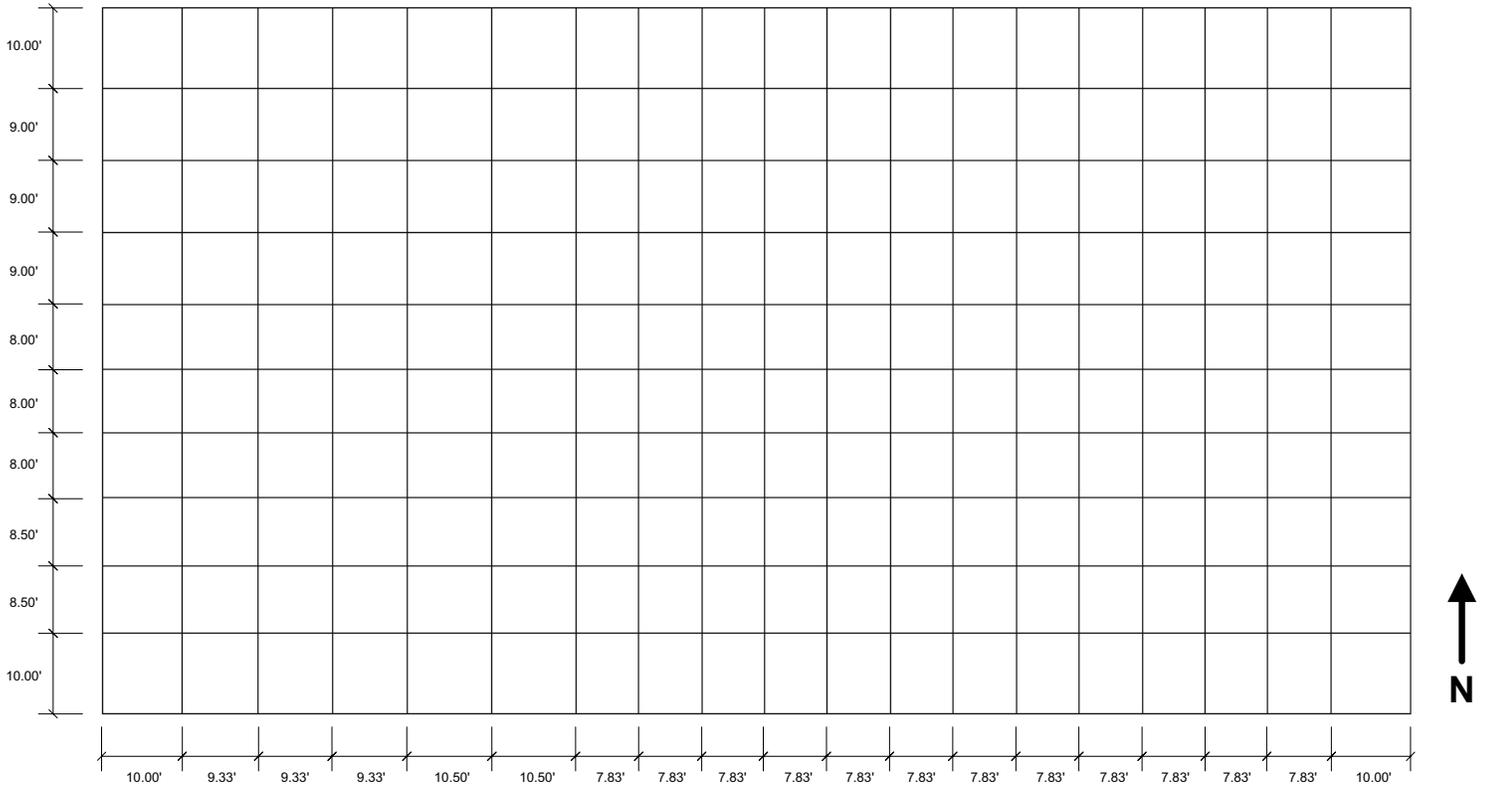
H.6-15g: RSW Pump House Basemat – SSI Model
